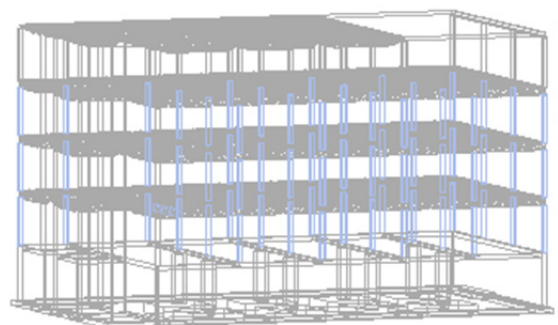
Glue-laminated columns supporting floors 1 to 3 against the basement.
